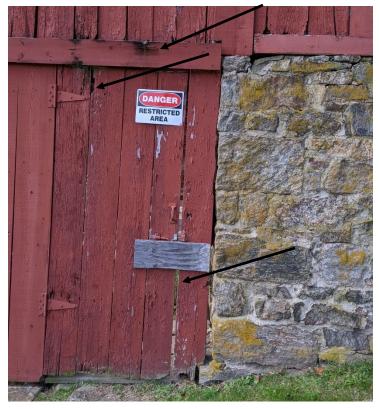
View of door D102 at the east elevation showing wood loss, paint loss, and separation between boards. Also note the wood rot at the door hood above, and the loss at the ends of the siding boards.
